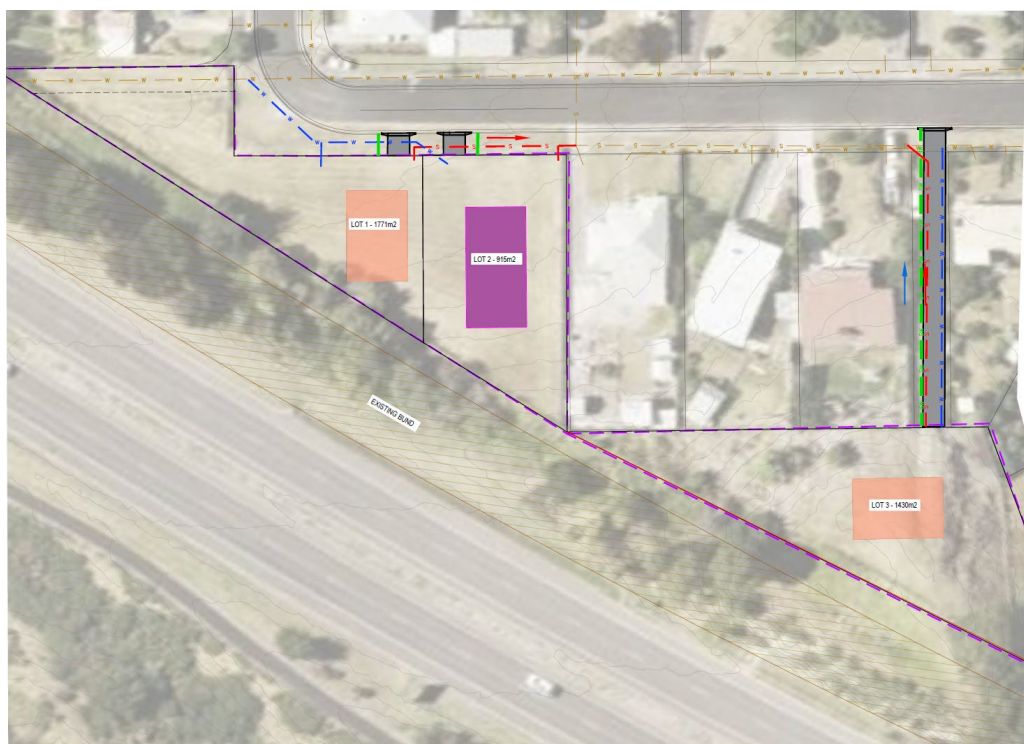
Concept site plan for residential subdivision (Source: Flussig Engineers)
